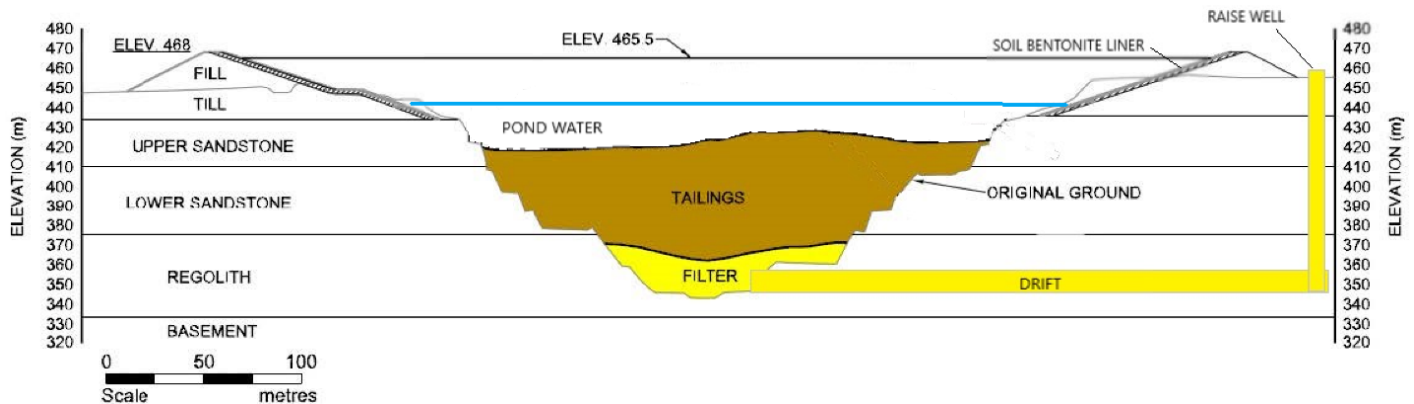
Cross Section of the JEB TMF at Future 468 Masl Elevation
